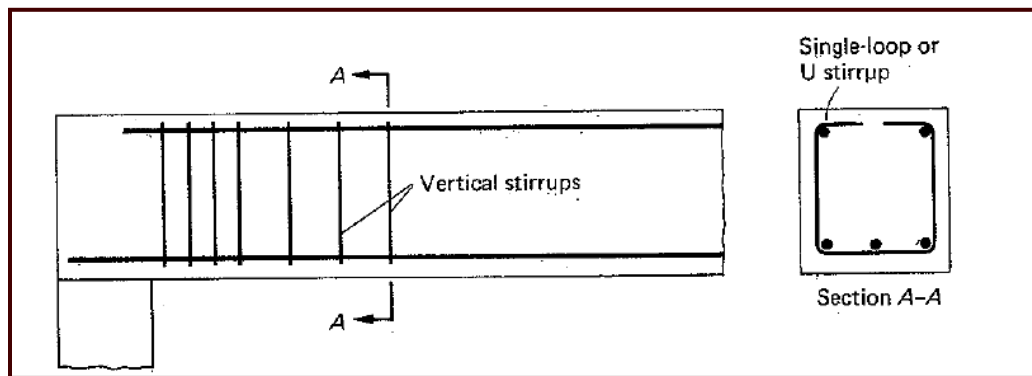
Typical Shear Stirrup Arrangement (Wang et al. 2007, 131)
